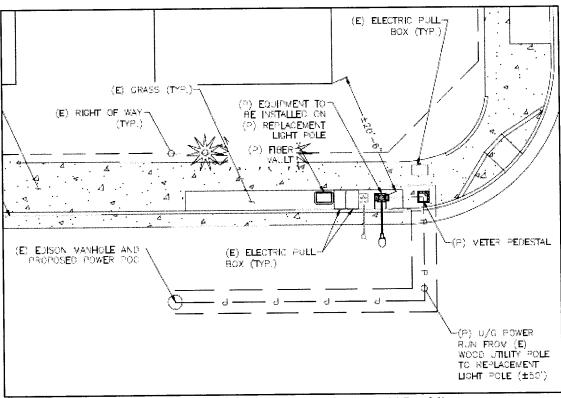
Underground power and fiber connections (Source: Plans Page A1 Panel 1).
